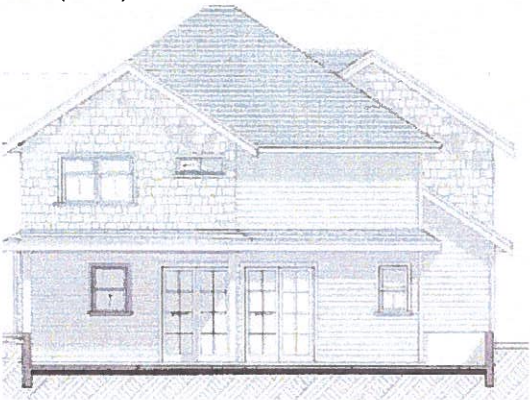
Proposed Elevations – Lot A (from plans by Adapt Design)
